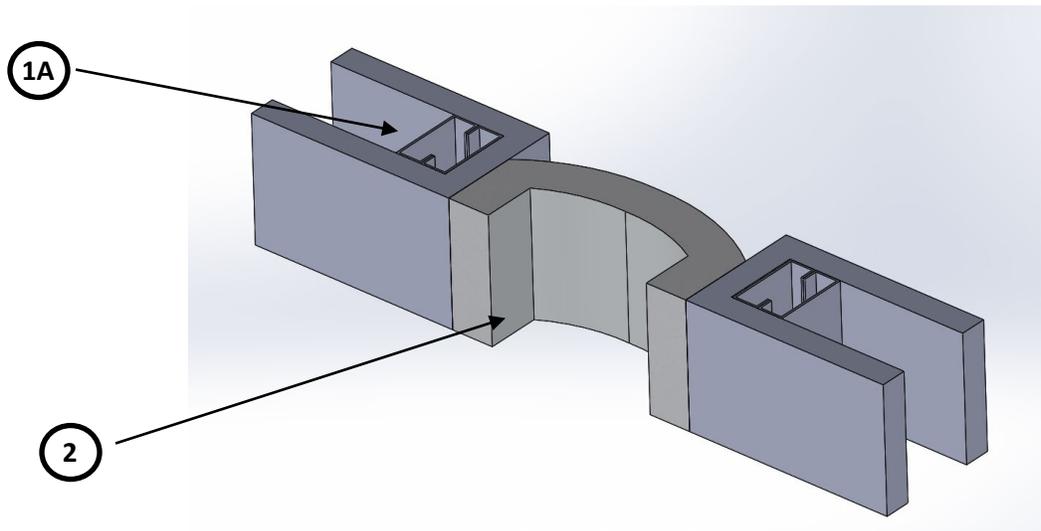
MetaFlex® Pro Shear Fire Barrier Wall Joint
